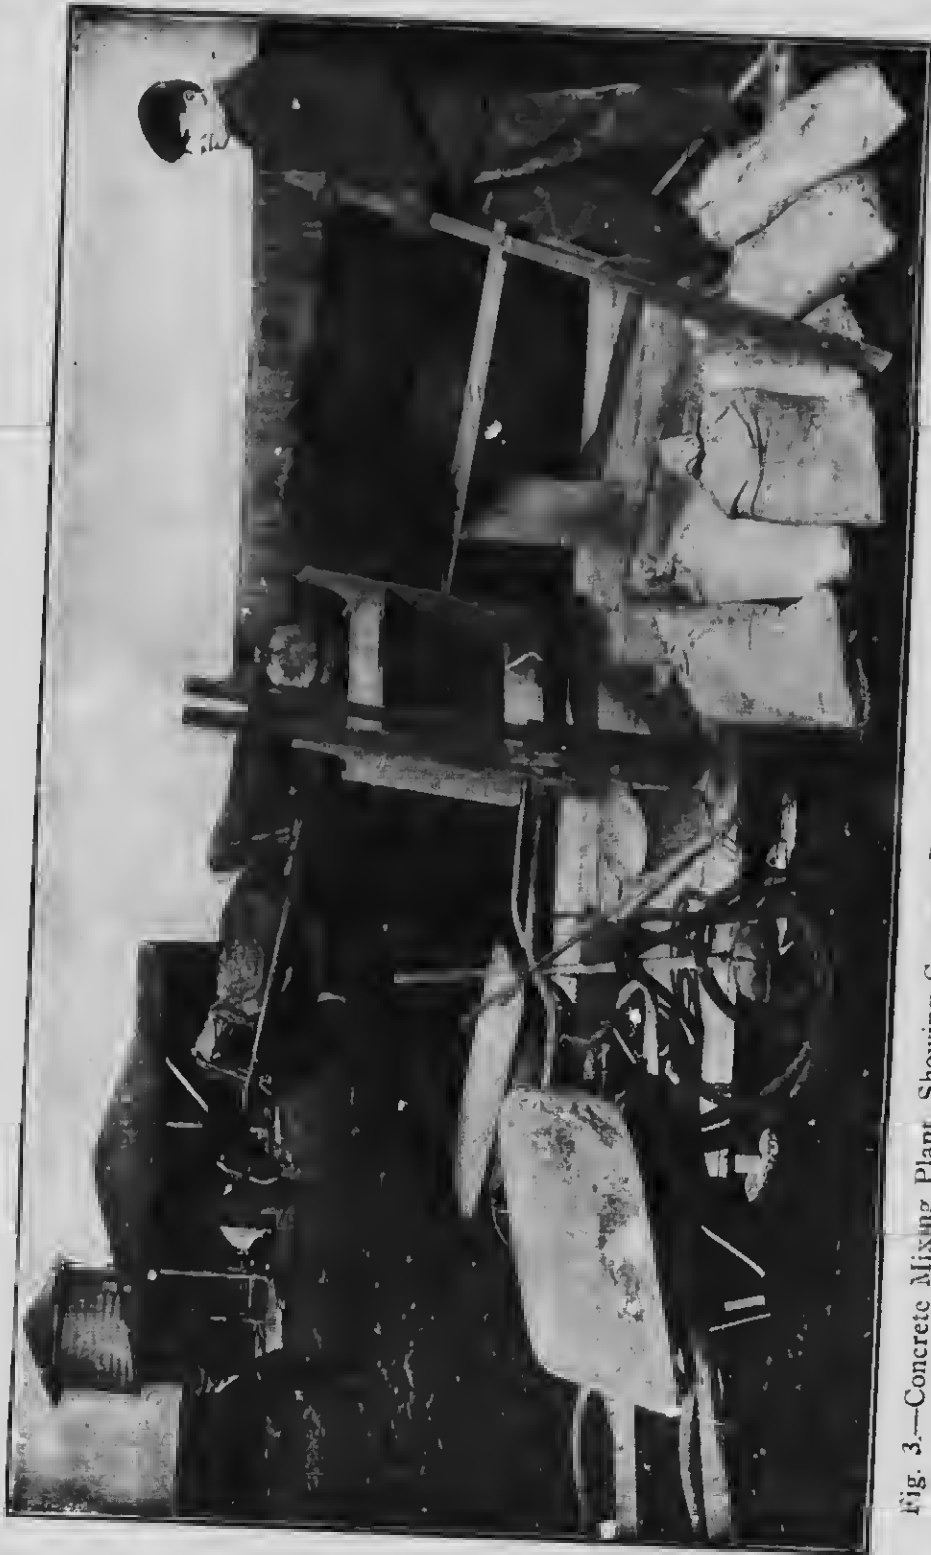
Concrete Mixing Plant, Showing Concrete Board, Tools, etc., Necessary for Mixing Concrete by Hand.
